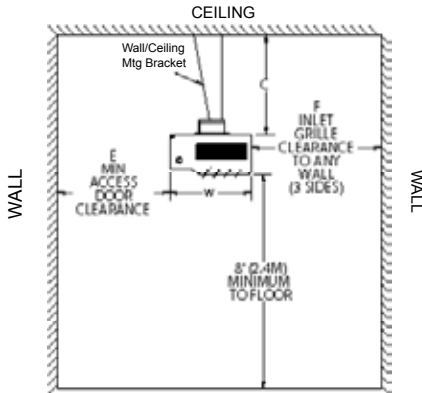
VERTICAL CEILING MOUNT WITH MTG ARM
